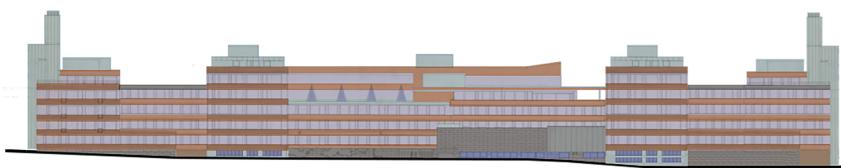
Elevation to the southwest with elongated vertical facade (Alvar Aalto Foundation 1955), altered by authors.
